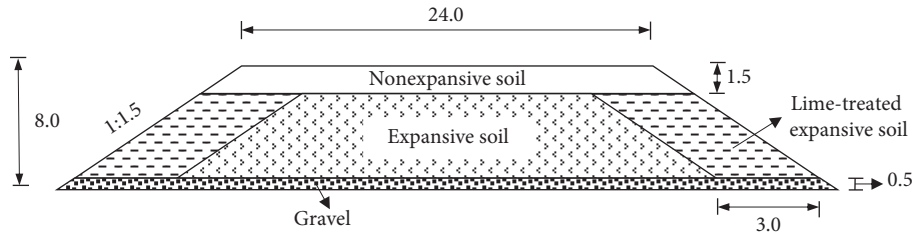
Structure of lime-stabilized embankment (unit: m).
